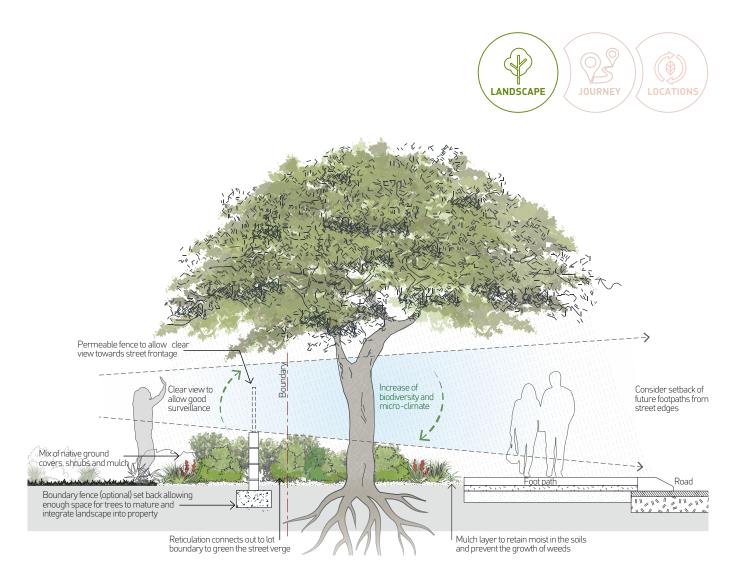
Typical section illustrating landscape strategy for verge areas and house frontages
